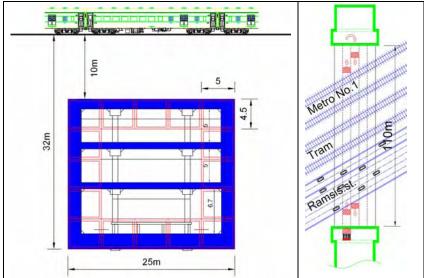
Plan at Station No. 8 (Ghamrah)
